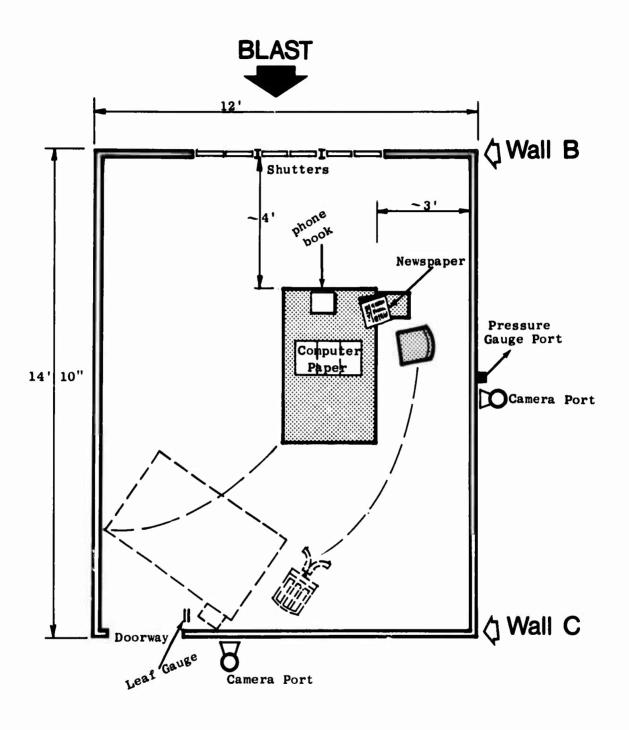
Floor Plan of Office Showing Pre and Posttest Positions of Furniture (Test 6).
